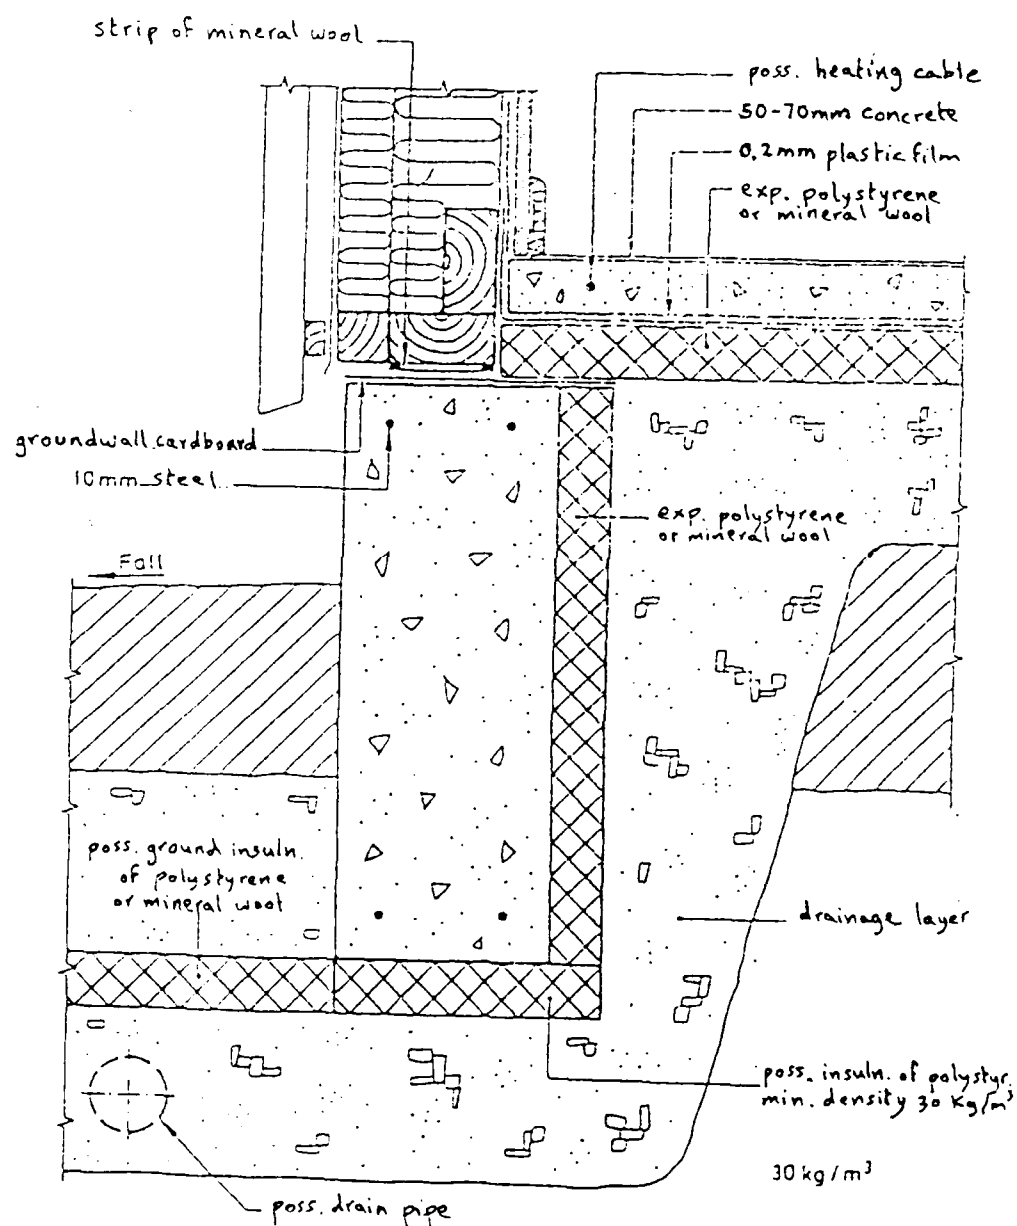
Concrete slab with internally insulated concrete foundation wall
